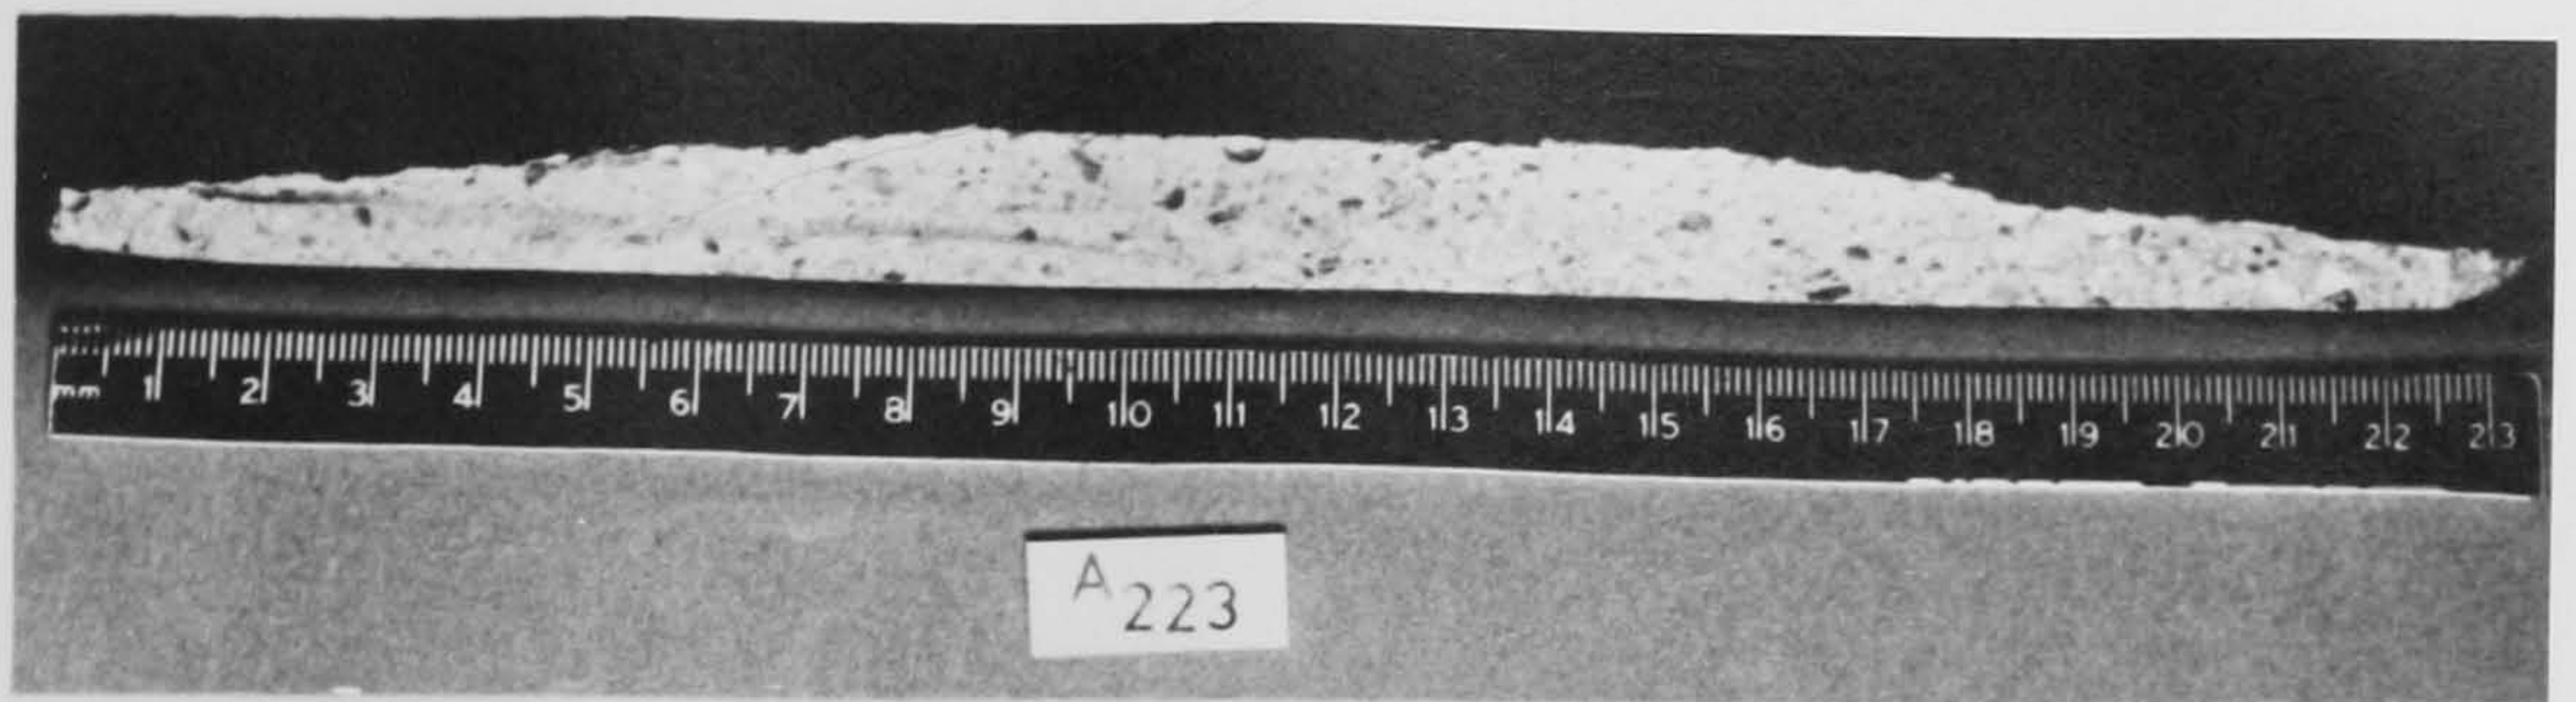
CROSS SECTIONS OF SPALLED PIECES FROM SPECIMENS TESTED WITH BIAXIAL LOADING
